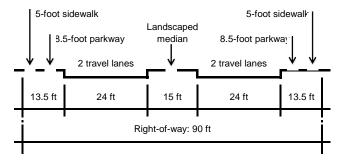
Gene Autry Way (East of Haster Street) Cross Section
